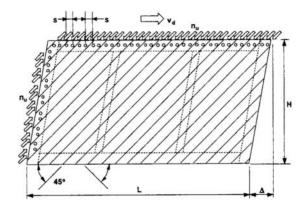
Diagonal Lumber Shear Wall Sheathing Diagram
